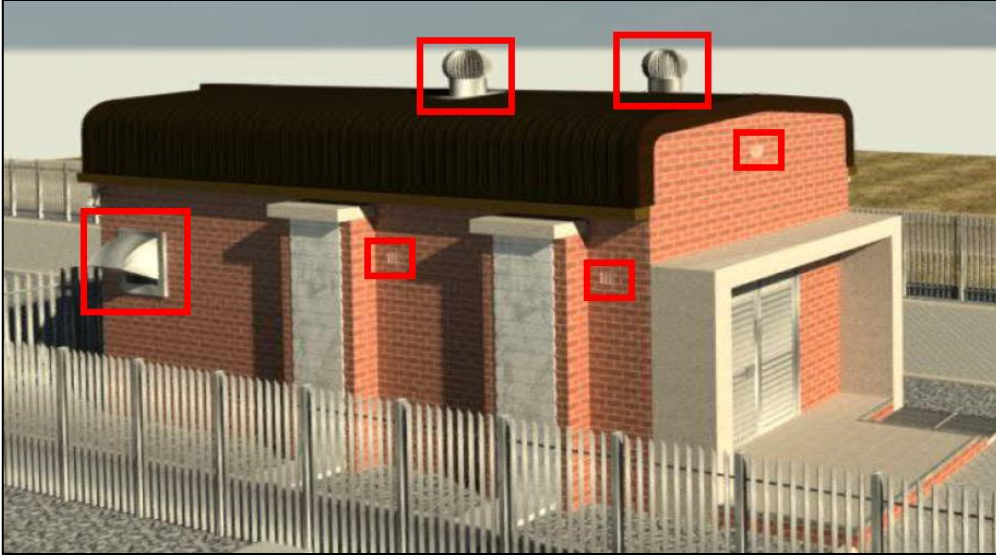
Exterior view showing airbricks, wall mounted extractor fan and roof ventilators.
